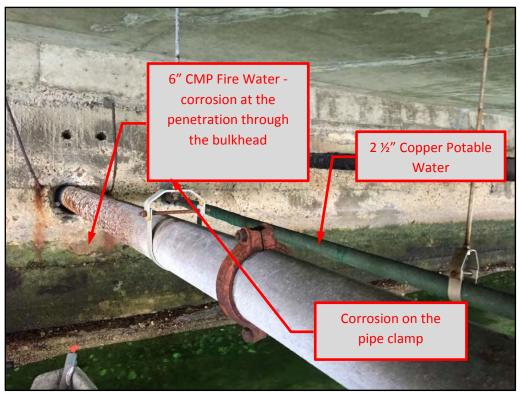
Existing 6-in. CMP Fire Water line showing corrosion on the landside connection of the pipe. The 2 ½-in. potable water line is seen behind the 6-in. pipe.
